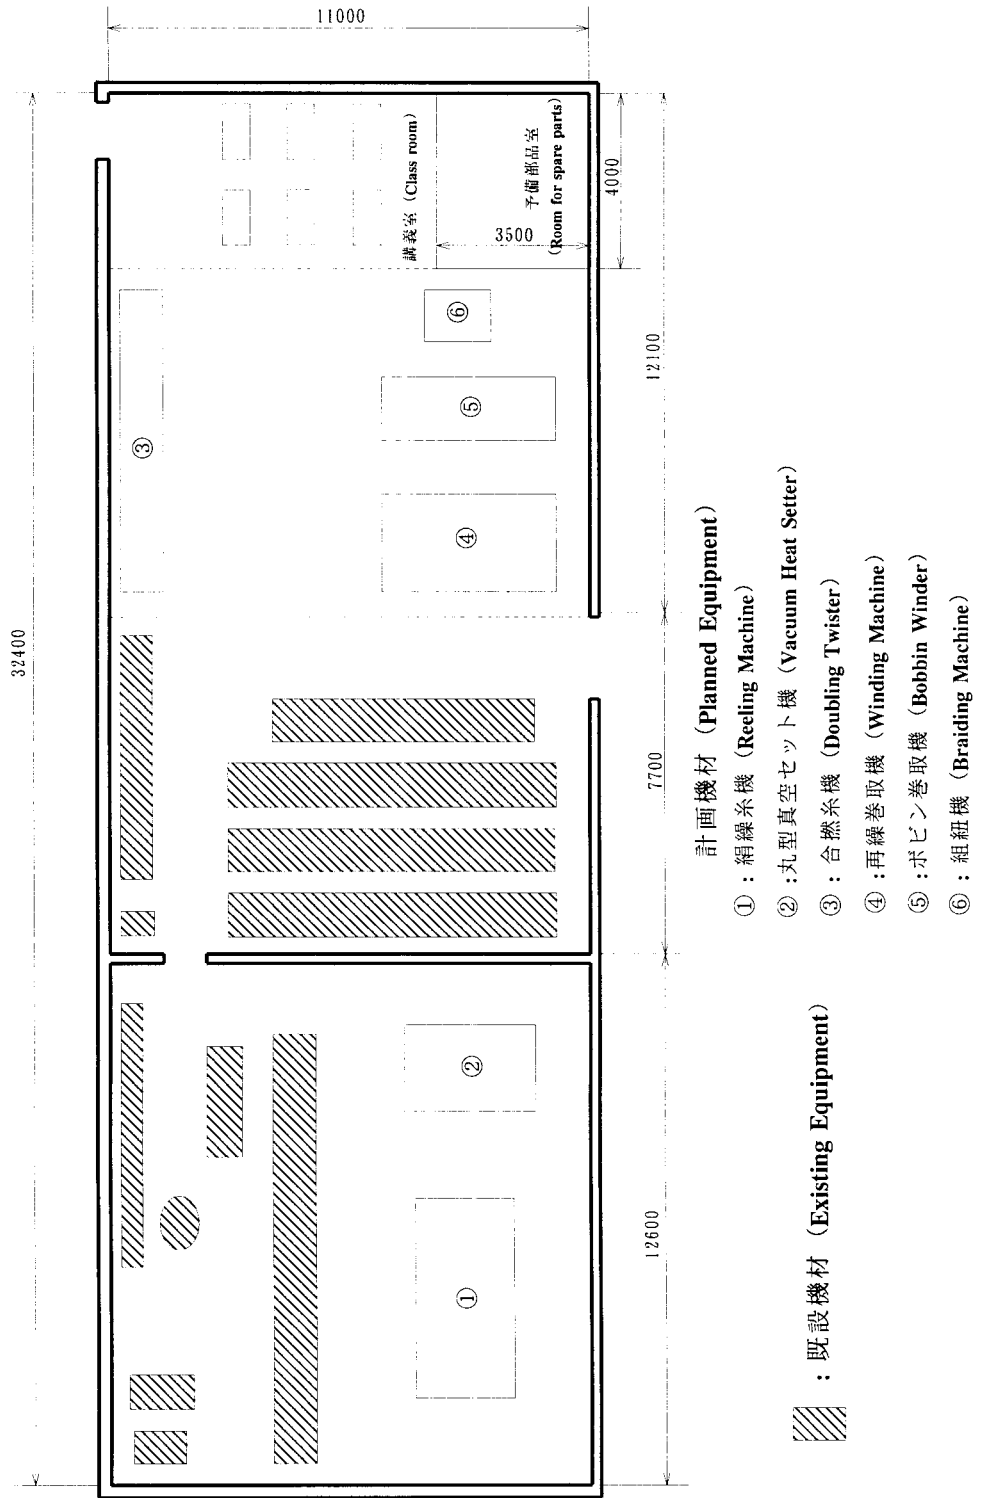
Layout Plan (3) Silk Technology Laboratory
